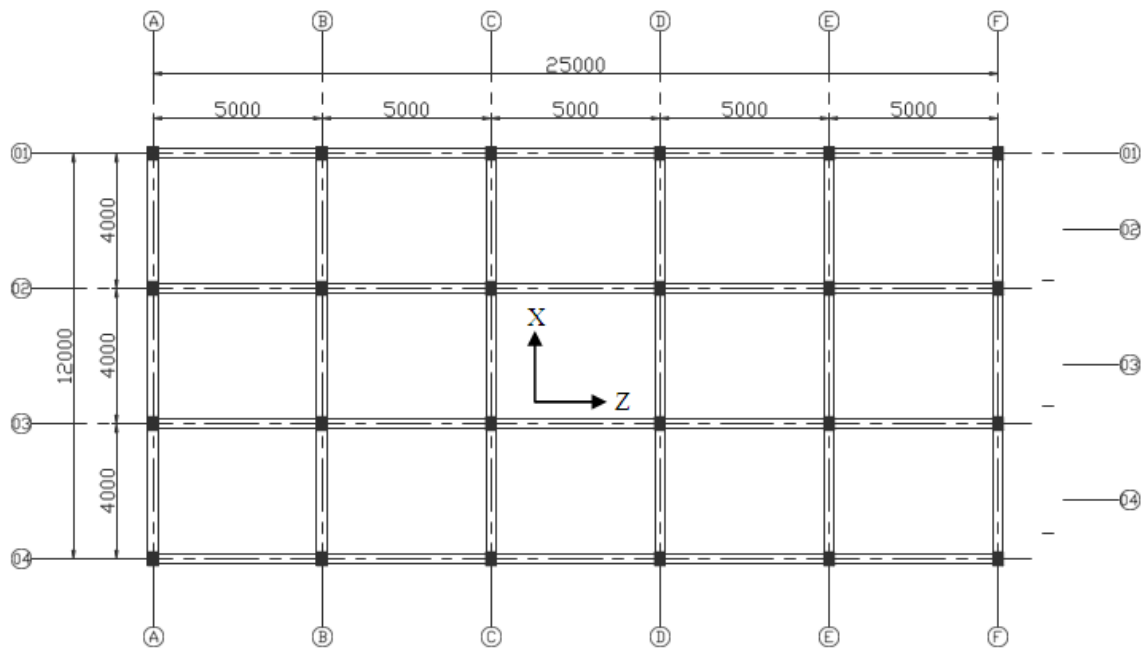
Plan of two, six, and twenty-story regular RC buildings (all dimensions are in mm)
